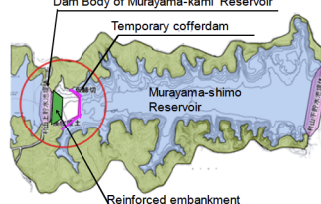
Conceptual diagram of water storage situation during reinforcement construction of dam body
